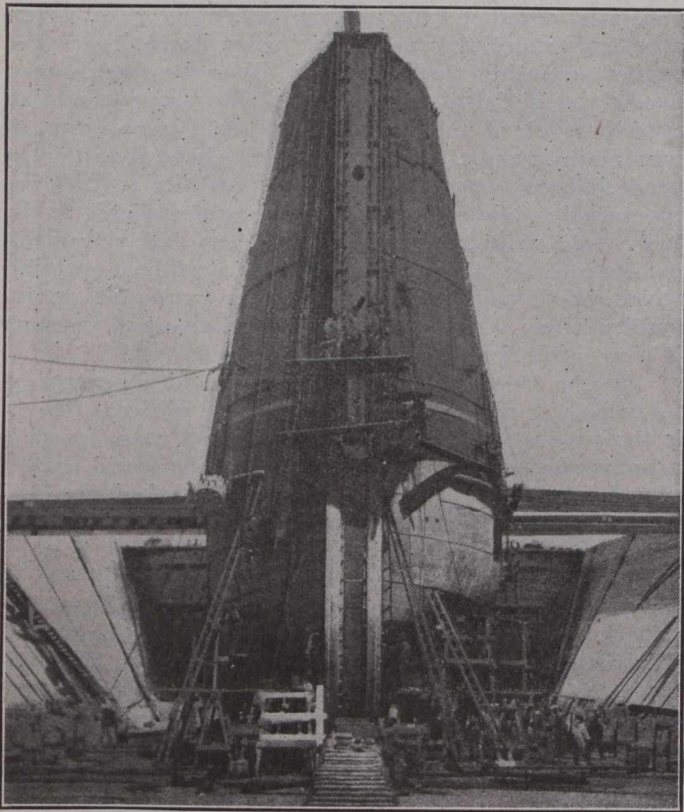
Caisson Under Construction for Panama Canal Locks.
